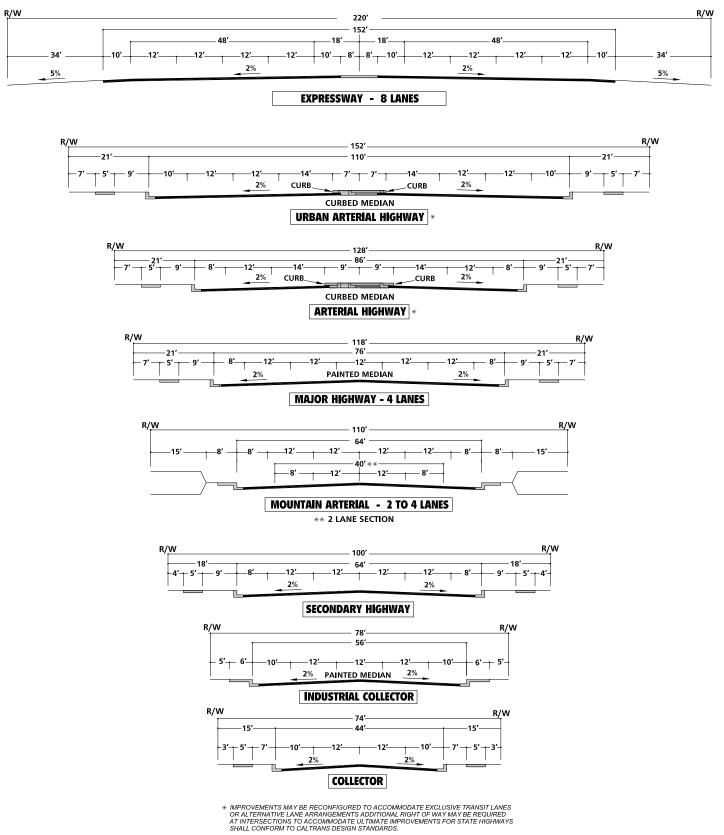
COUNTY OF RIVERS GENERAL PLAN ROADWAY CROSS-SECT
